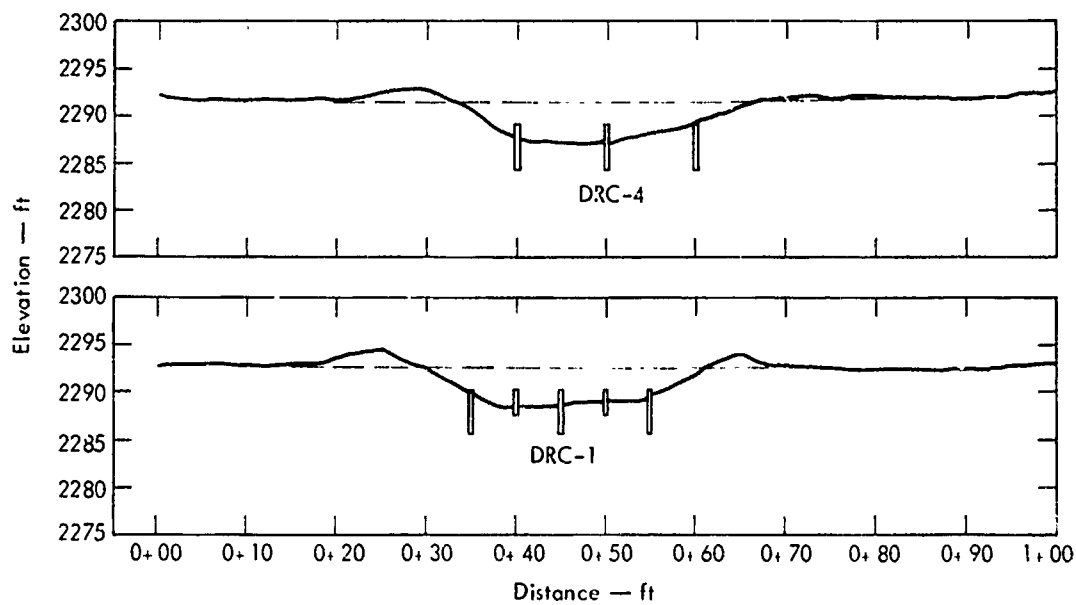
DRC-4 and DRC-1 longitudinal profiles.
